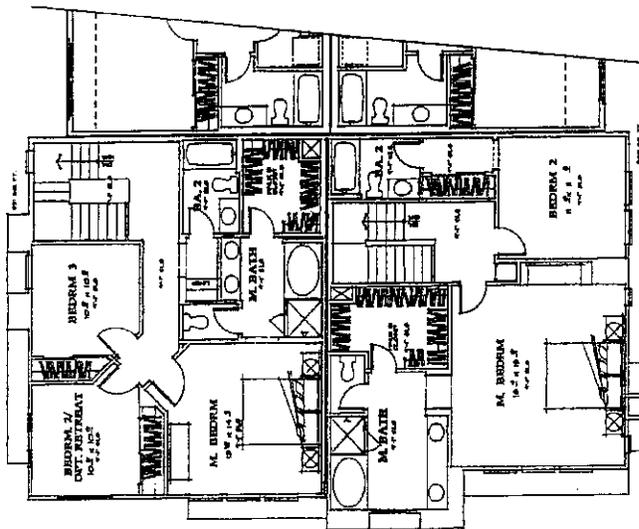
M – Arborelle – Building B – Floor Plans and Elevations
